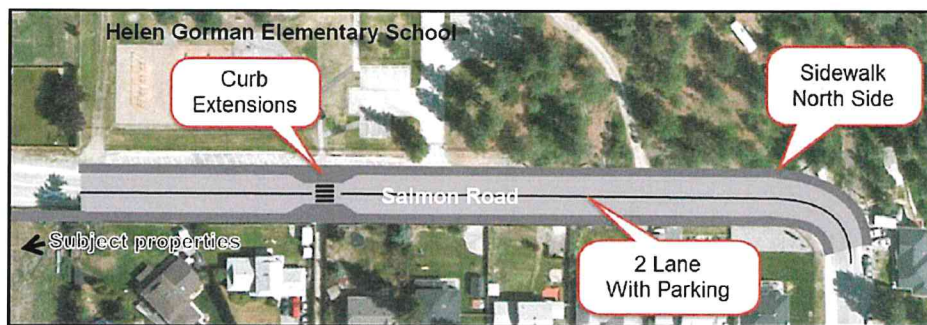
Illustration of proposed curb extension at crosswalk to improve pedestrian safety
